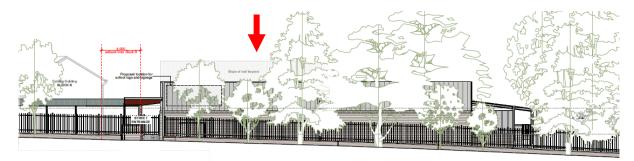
Western elevation of Sutherland Public School, with the western elevation of the proposed hall (indicated by red arrow) obstructed by mature street plantings. Source: BKA Architecture.
